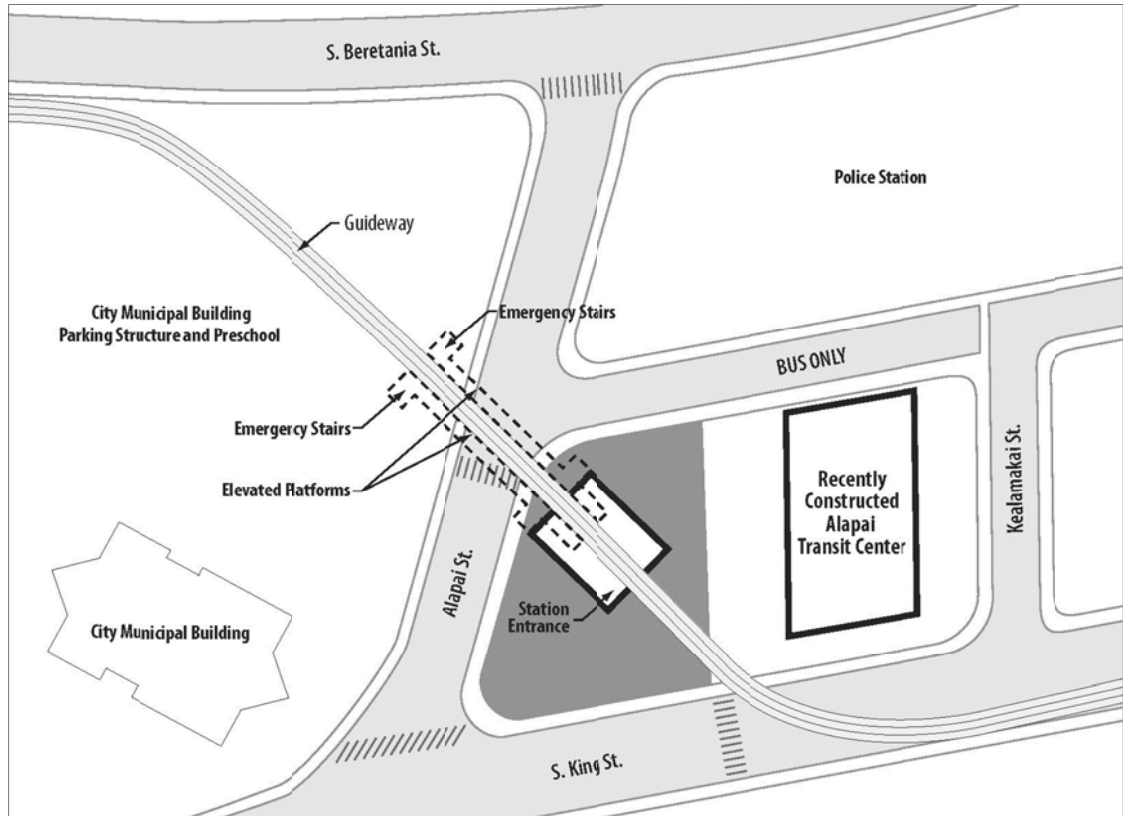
Beretania Street Tunnel Alternative Alapai Street Station
